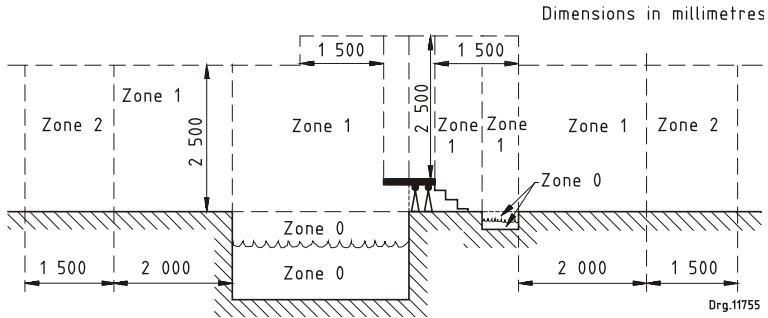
Elevation of zone dimensions for swimming pools and paddling pools
